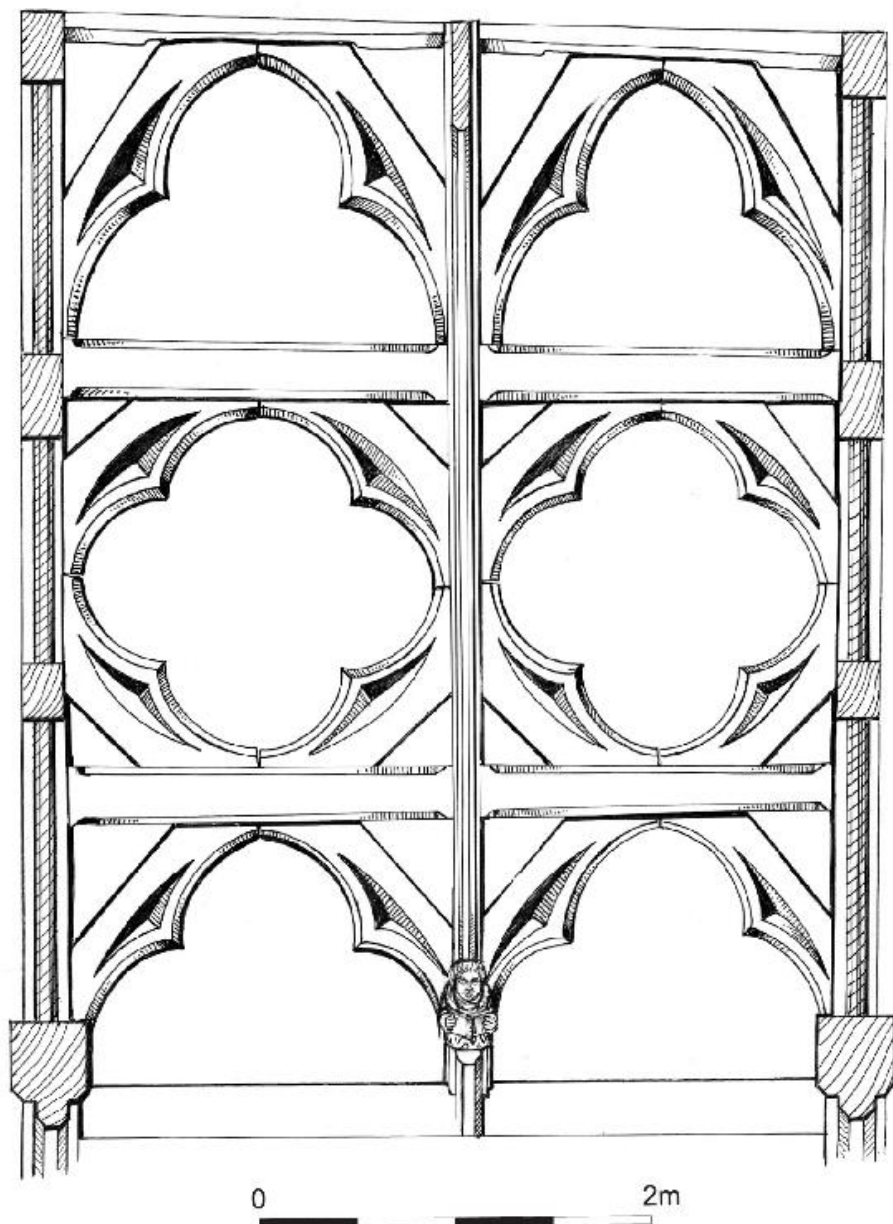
Typical cusped wind-bracing in one slope of the Booth Hall roof, partly reconstructed
